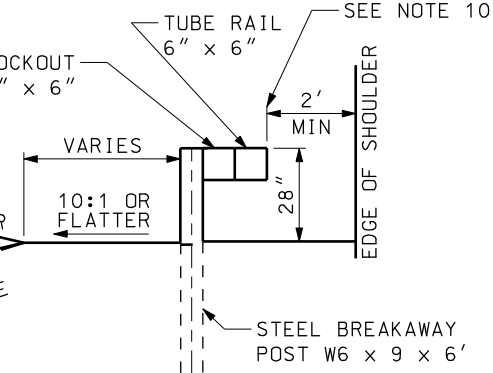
DETAIL WHEN SYSTEM IS INSTALLED WITH CONSTANT SLOPE BARRIER
